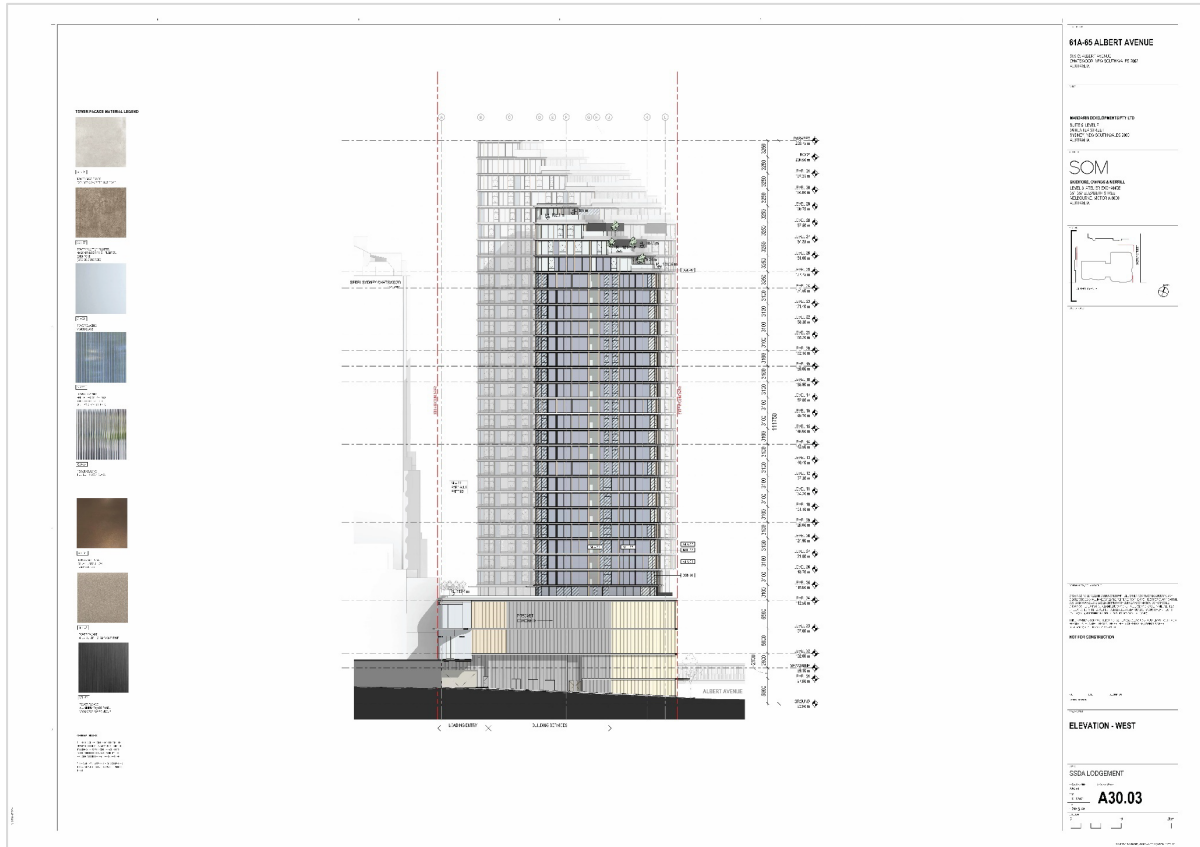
West-facing Elevation. (Source: SOM. 2025)
